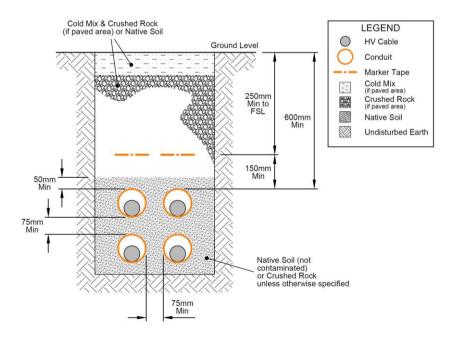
Typical Trench Section - 600mm Minimum Cable Burial Depth (4 conduits shown)
